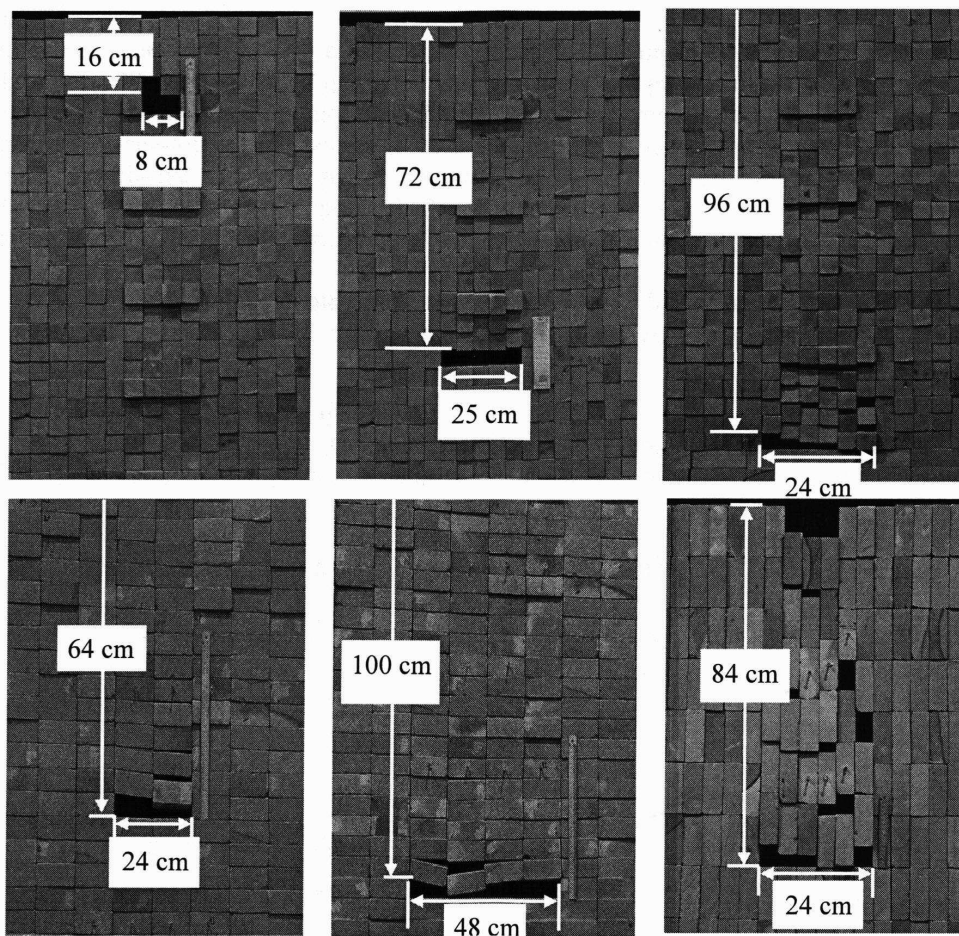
Examples of physical models showing roof failure after opening widths exceed their maximum unsupported spans. Top: openings in rock mass model formed by 4×4 blocks. Bottom: openings in rock mass model formed by 4×12 blocks.
